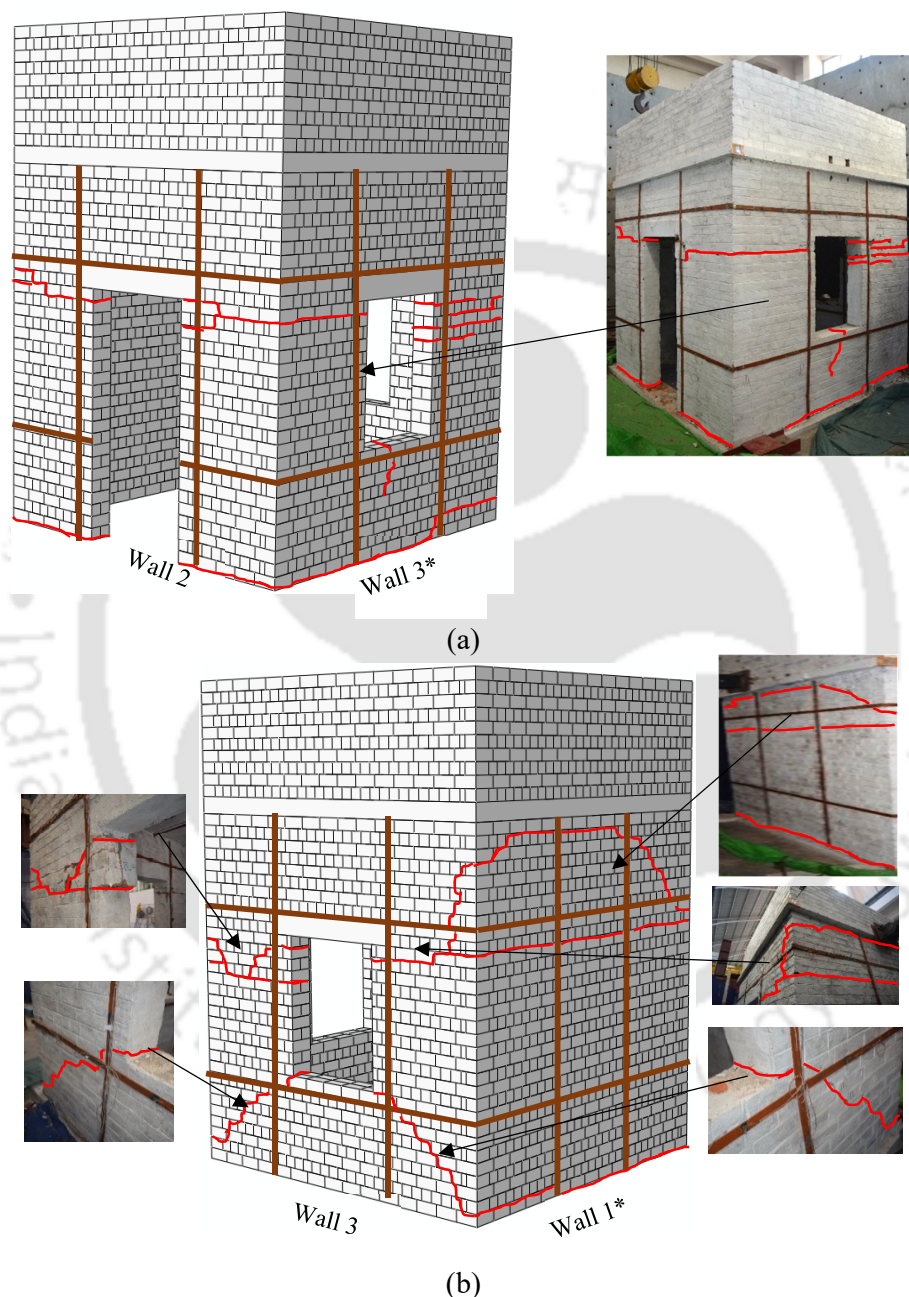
Damage observed in different walls during lateral load testing of the strengthened building 2 (Model 2): (a) Walls 2 and 3*, and (b) Wall 3 and 1*.
